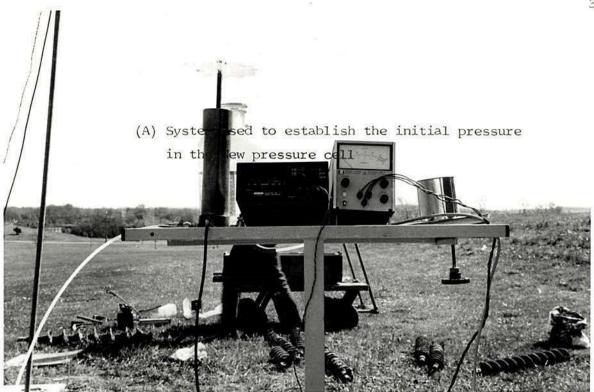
DETAILS OF THE INSTALLATION OF THE MODEL PILE AND NEW PRESSURE CELL
